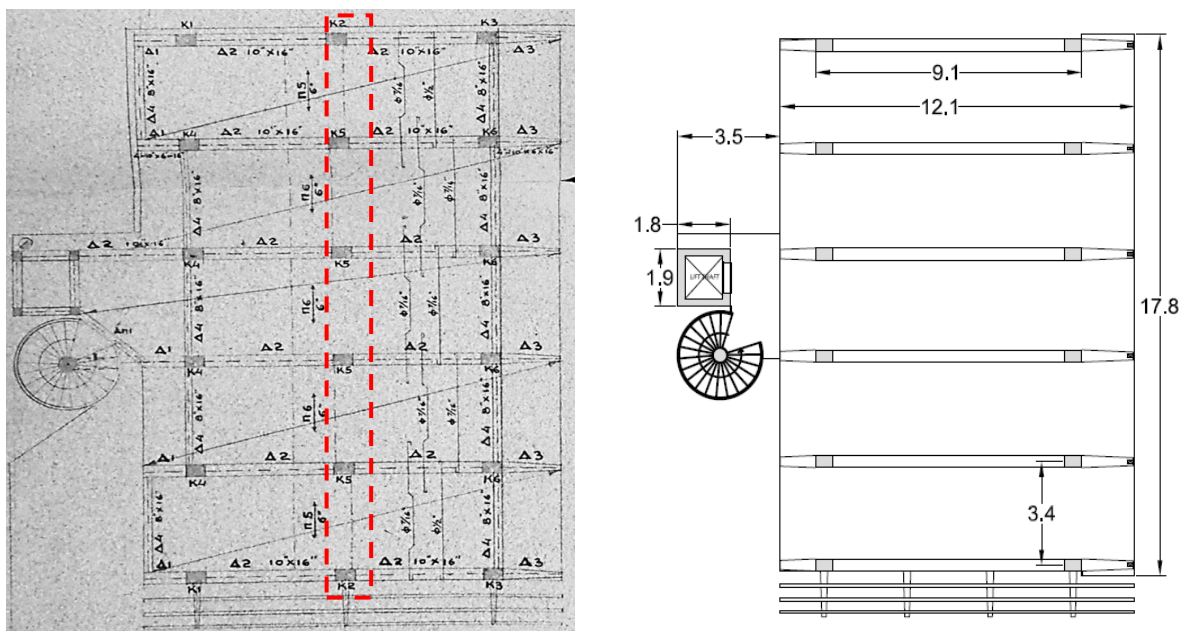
Typical floor plan as per: the original design (left) [7] and the survey plan (right)
